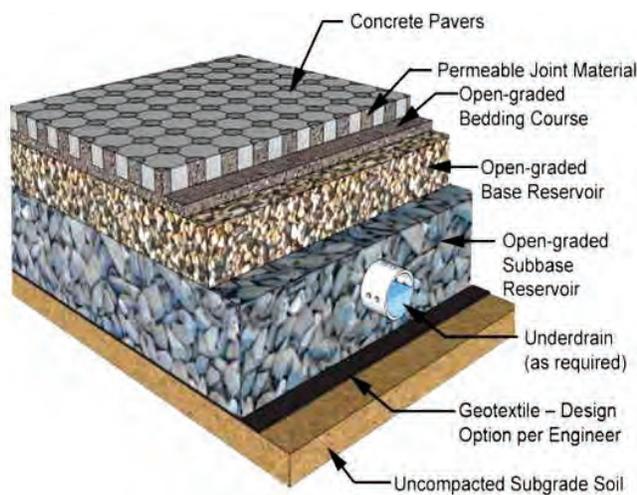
Permeable pavement section detail (Source: David Smith, ICPI)
